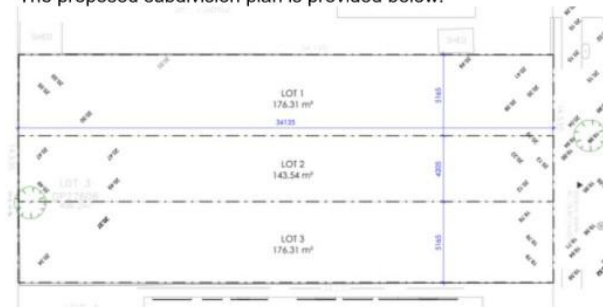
Proposed subdivision plan with Lot sizes for each lot = Lots 1 and 3 comply and Lot 2 at 143.54 is under the 165sqm min lot size control.
